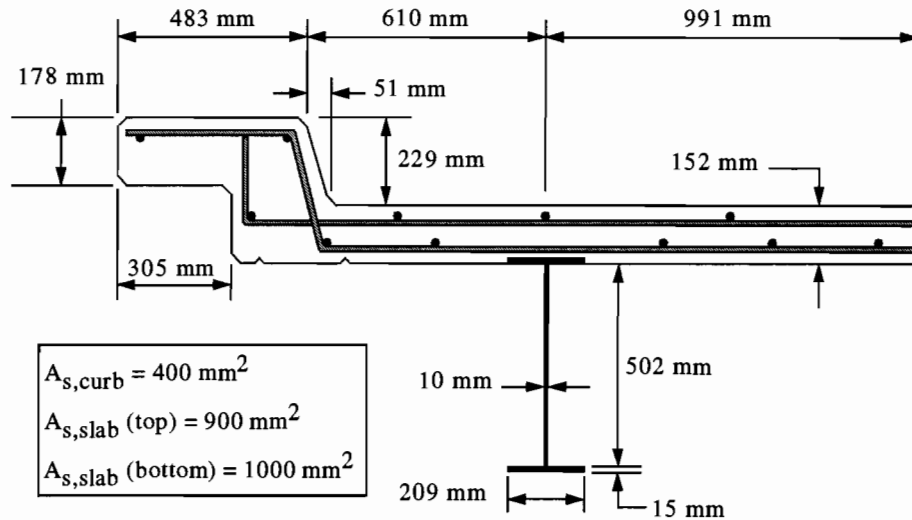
Details of a Typical Exterior Girder Section in the Positive Moment Region of the Bridge Units.
